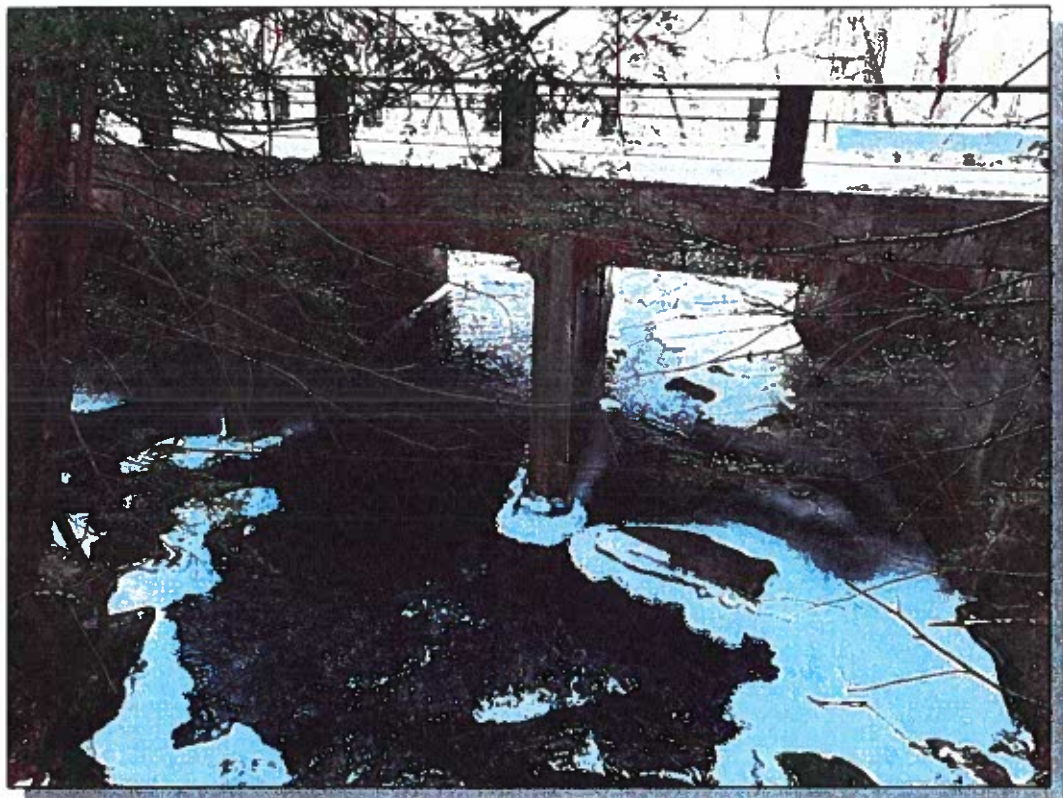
Bridge structure, upriver view from pedestrian bridge, facing southerly
